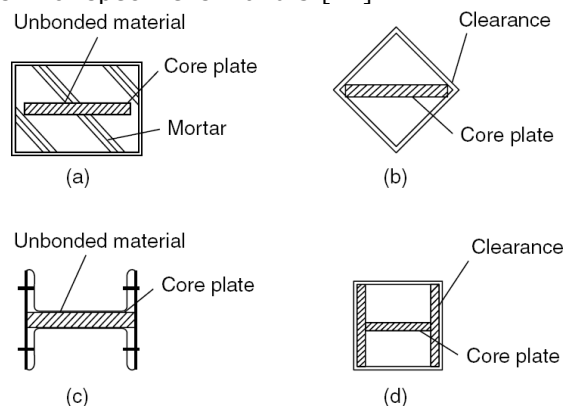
Section of four test specimens, a) Type 1; b) type 2; c) type 3; d) type 4 [33]
